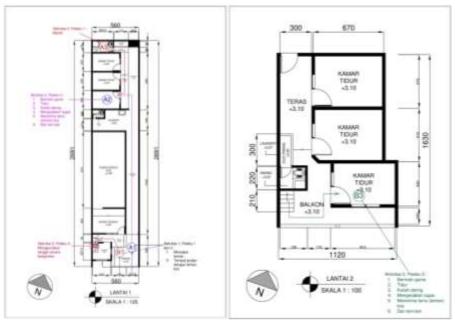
Plan of a Type A boarding house in Mulyorejo Village (Field Observation, 2022)
